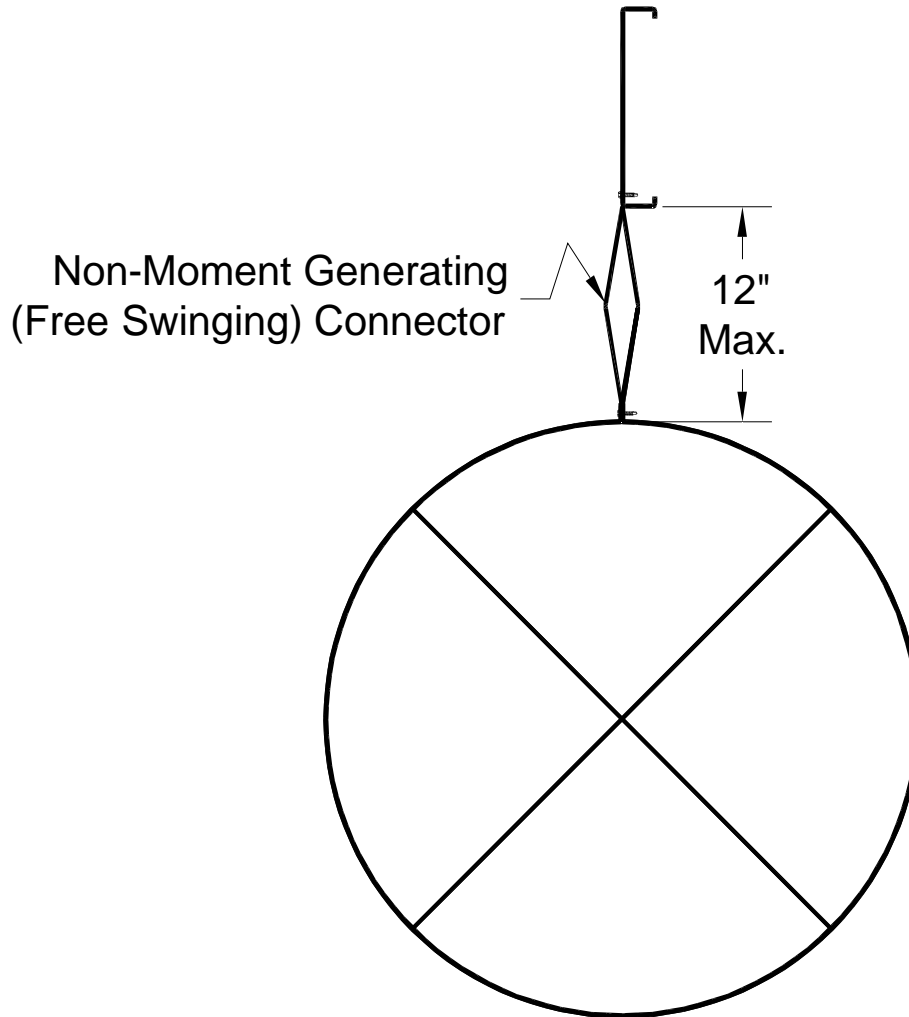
; Measurement of 12" Dimension for Single Hanger Supported Duct
